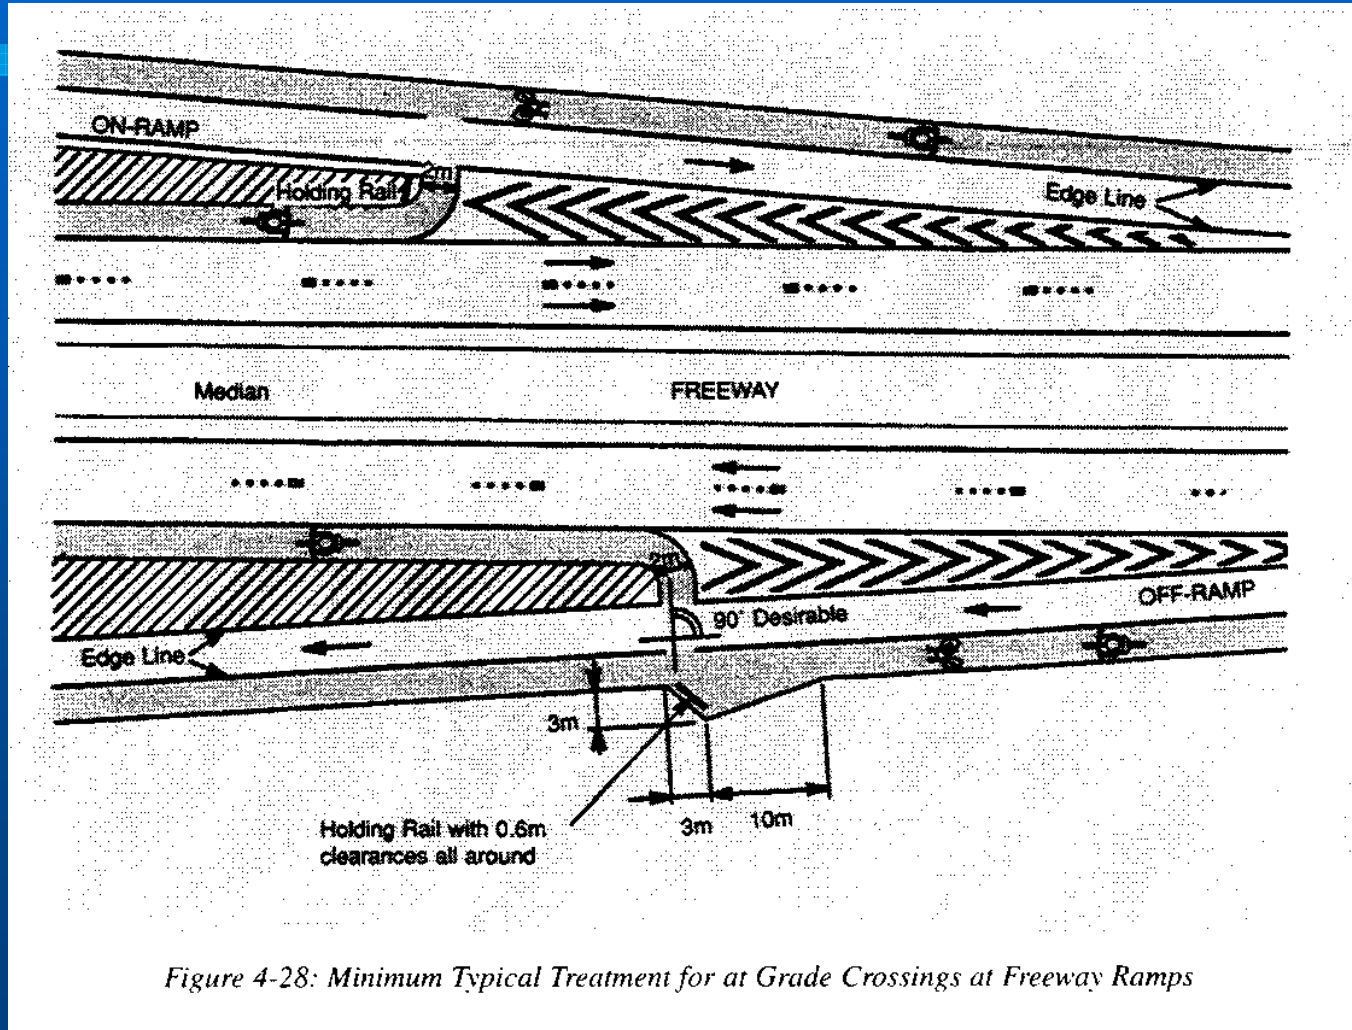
Minimum Typical Treatment for at Grade Crossings at Freeway Ramps
